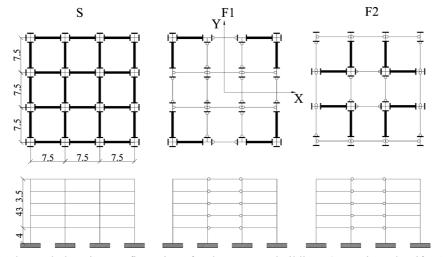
Plan and elevation configurations for the 5-storey buildings (Marusic and Fajfar 2005)
